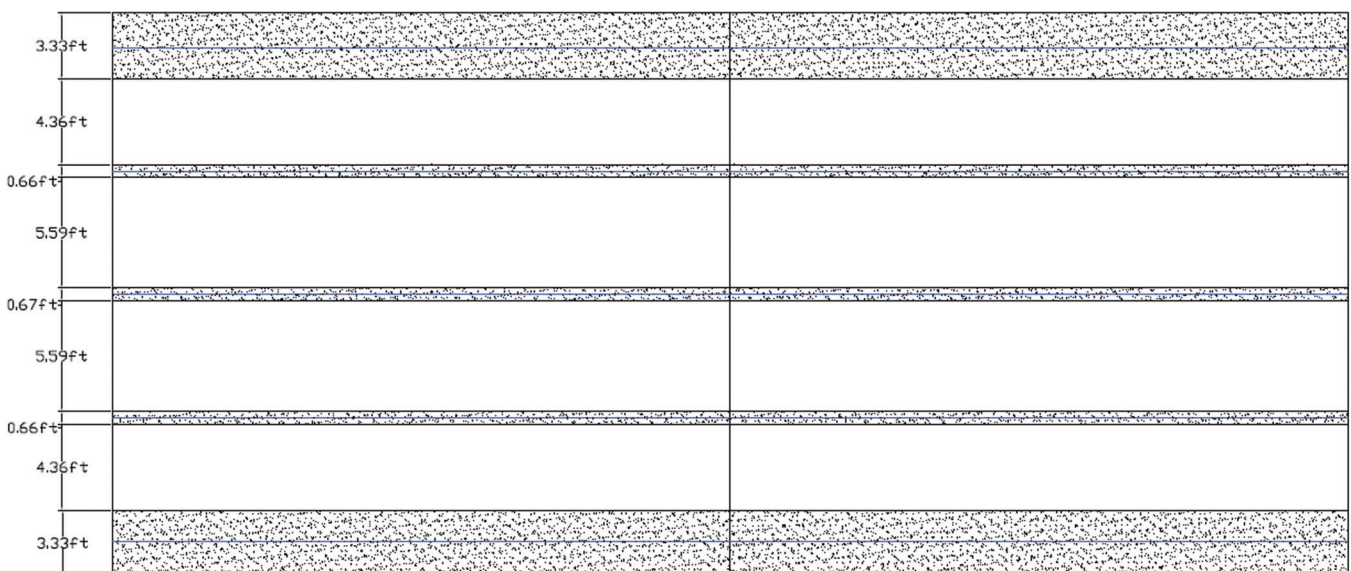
Plan View of Bridge Deck with Grouted Sections Shaded
